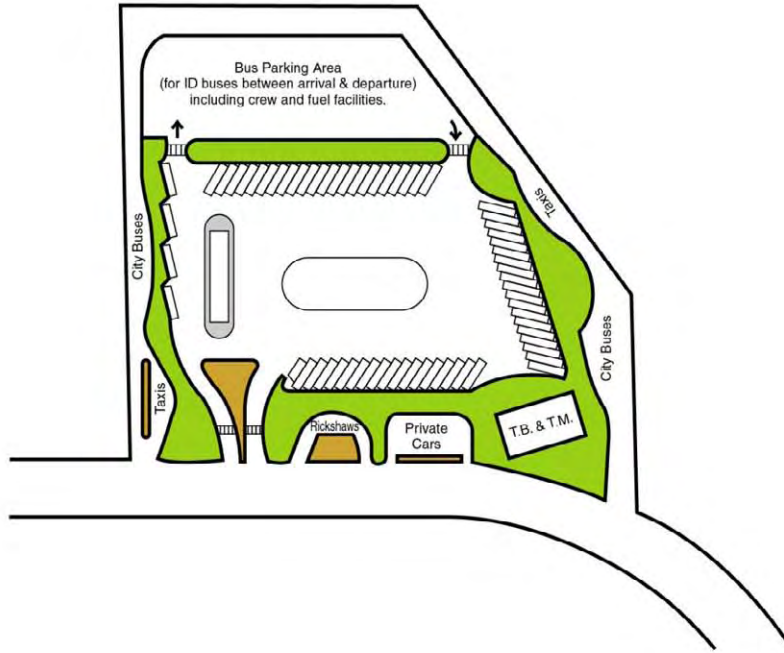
Plan Layout & Present Layout for Saidabad bus terminal
